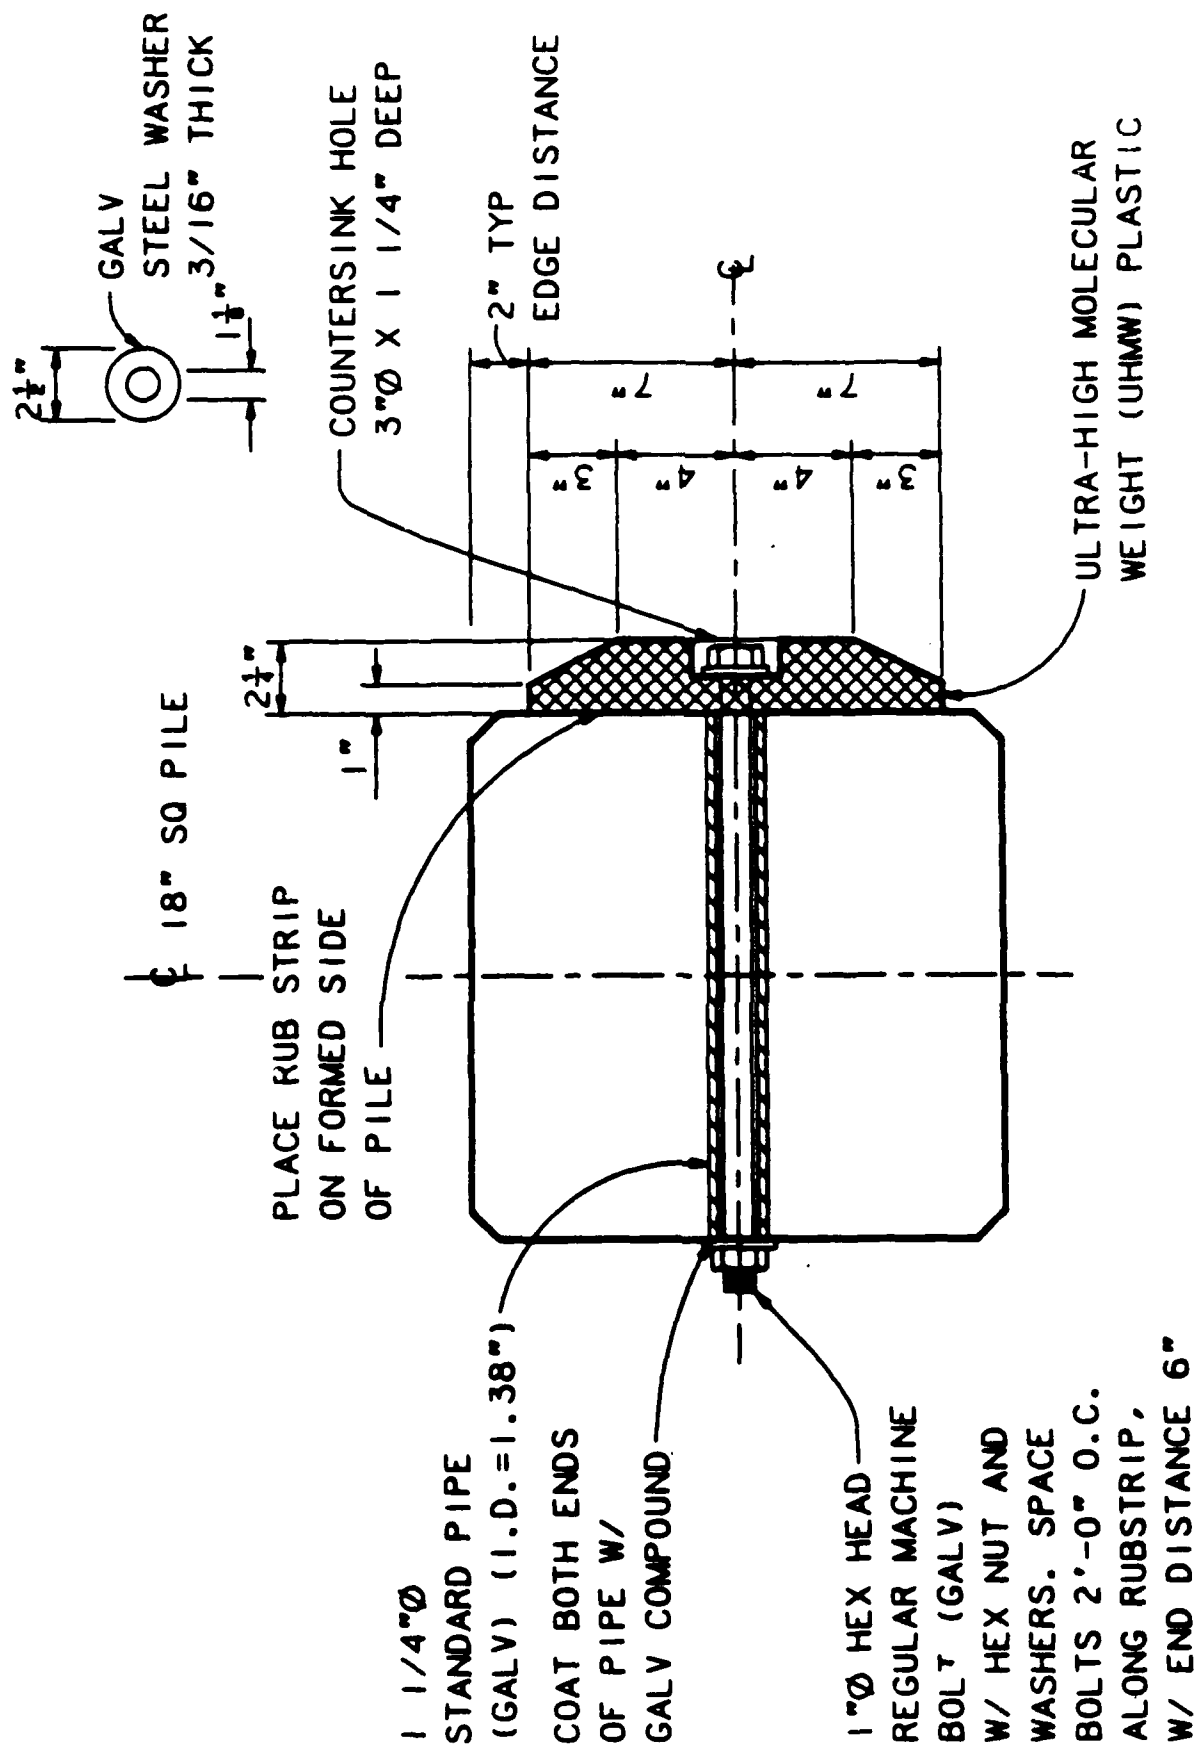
, ATTACHMENT OF RUBBING STRIP
